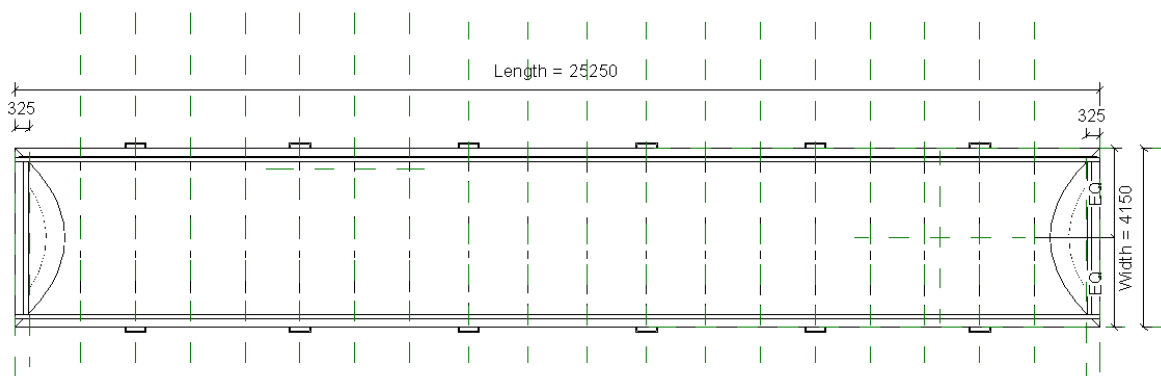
Plan View of Glazed Covered Walkway
